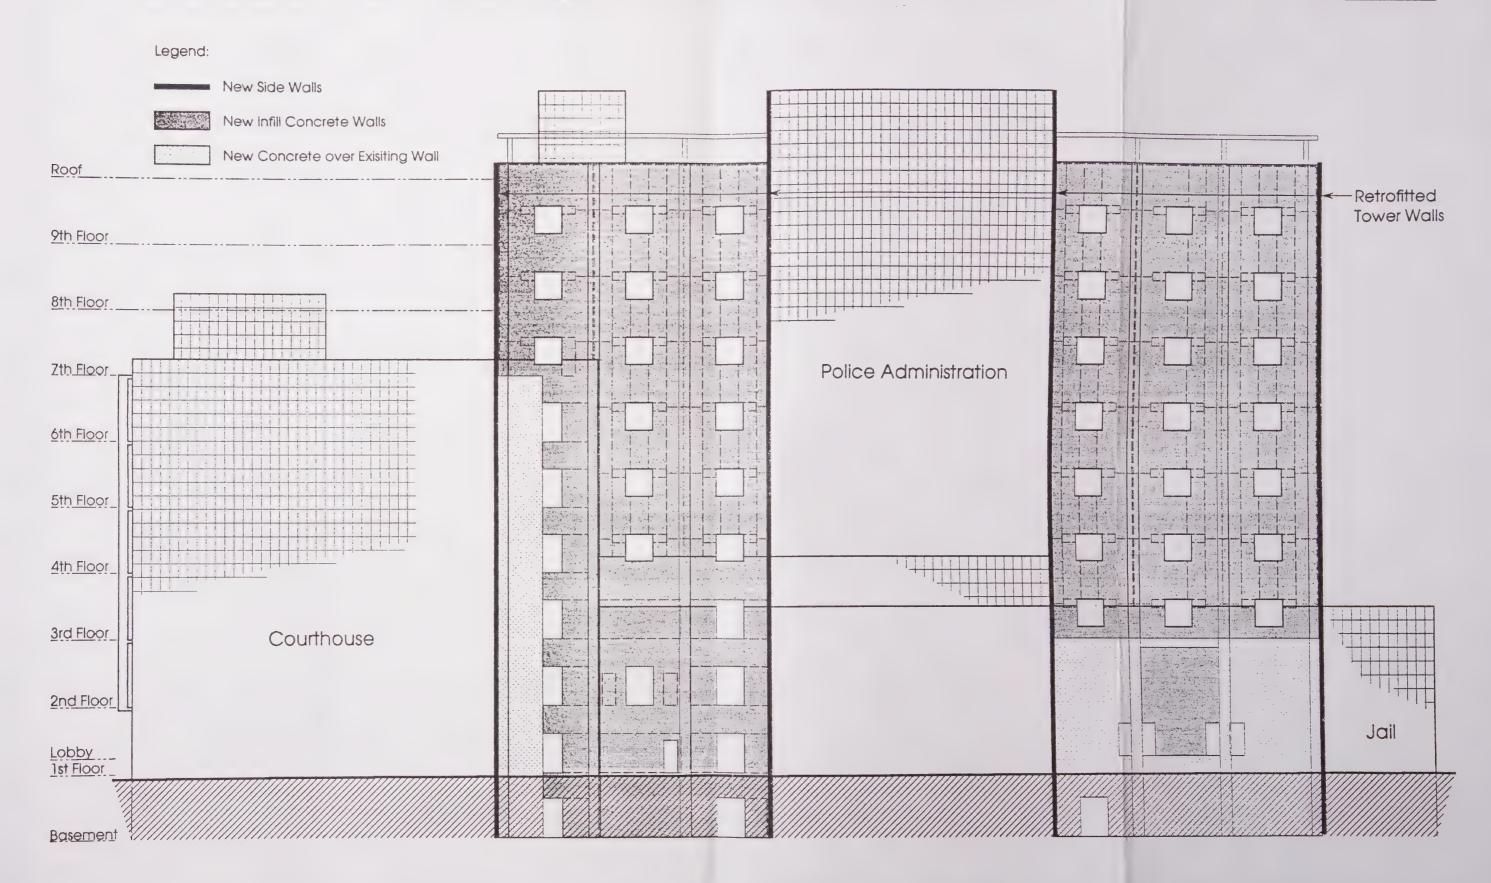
Retrofit Scheme - South Tower Wall Elevation
